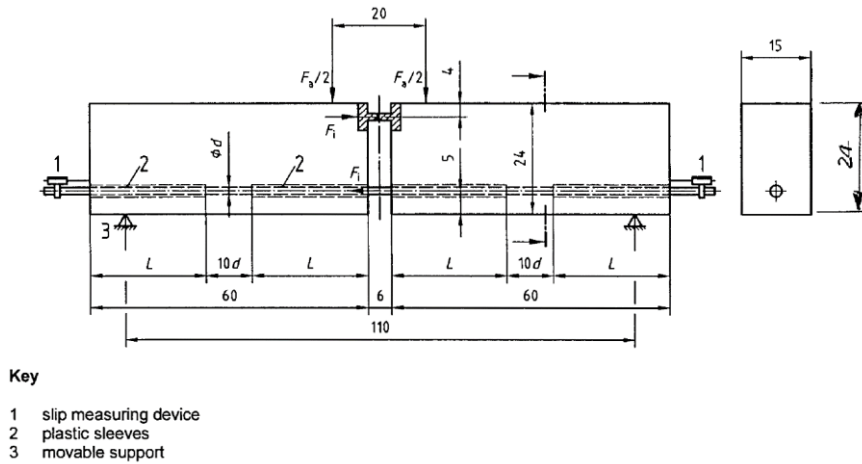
Beam test type B ($d \geq 16$ mm)
